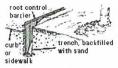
A vertical underground barrier will help keep tree roots from damaging concrete as they grow.
